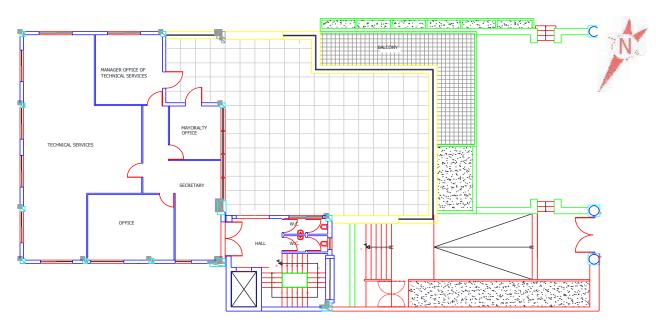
TYPICAL PLAN FOR THE THREE TOP FLOORS
